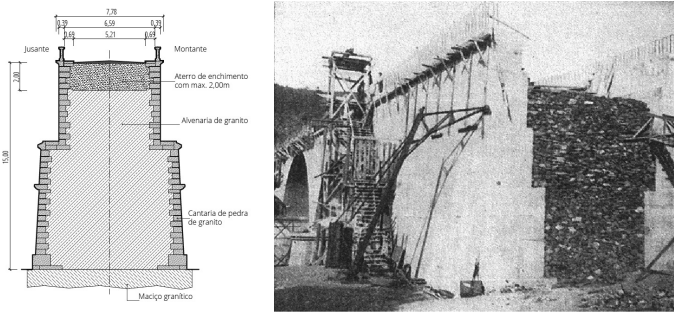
Transverse section of a pier and abutment (left drawing ref. [3]), (photograph ref. [6]) JAE and IP. a2p archive
